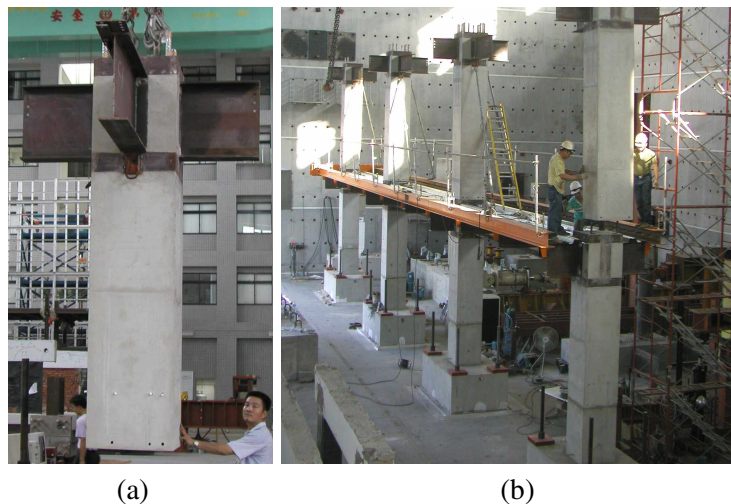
Construction photos of (a) a typical pre-cast beam-column module and (b) construction of the 2nd floor.
